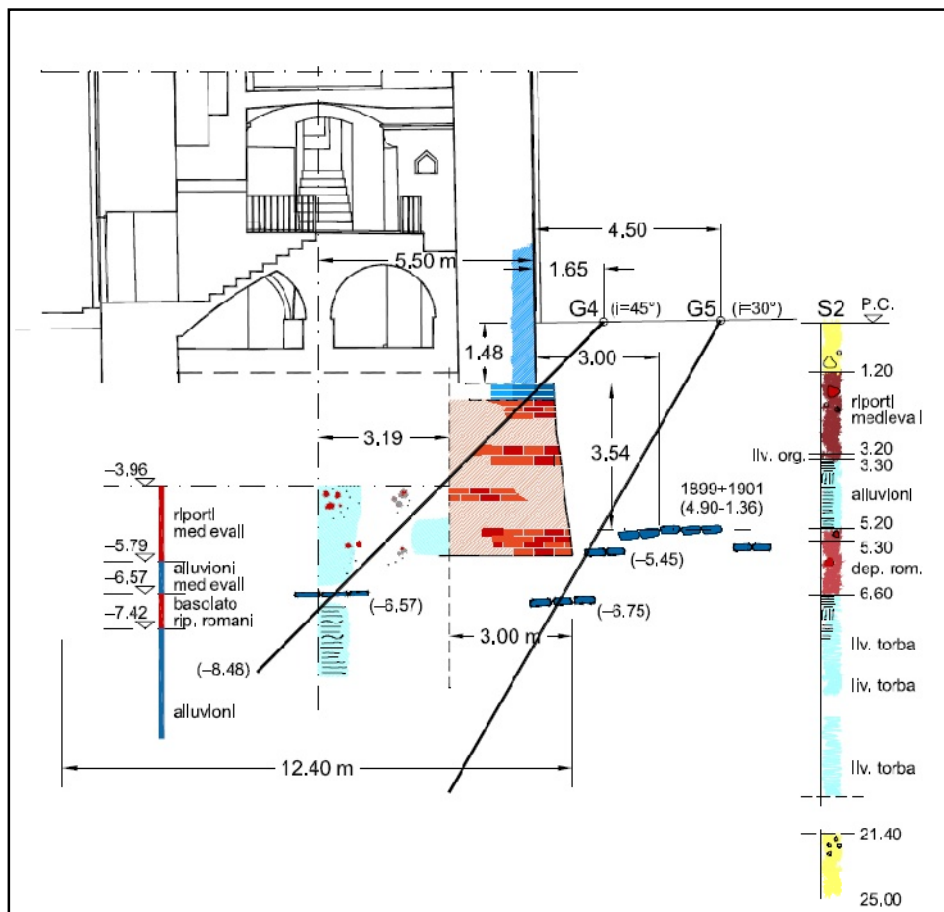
Details of soil profile and foundation of Ghirlandina Tower [11]
